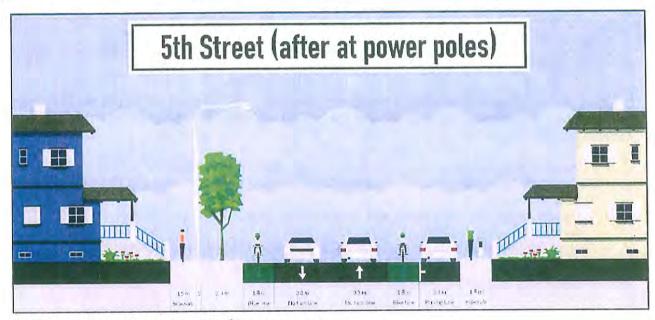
Proposed Cross-section for 5th Street at Hydro Poles
